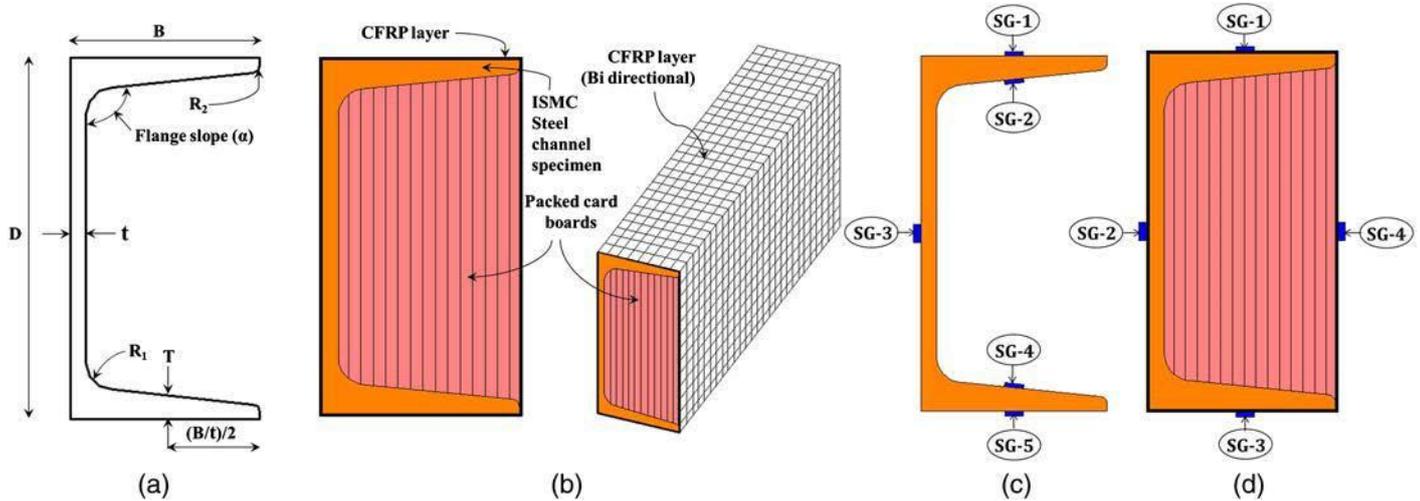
Test specimen: (a) cross-sectional dimensions of ISMC 75 specimen; (b) view of the ISMC specimen packed with cardboard and CFRP wrapping; (c) location of strain gauges at midspan for wrapping configurations B, S\_1U, and S\_1B; (d) location of strain gauges at midspan for wrapping configurations C\_1U, C\_1B, C\_1U1B, and C\_2U1B
